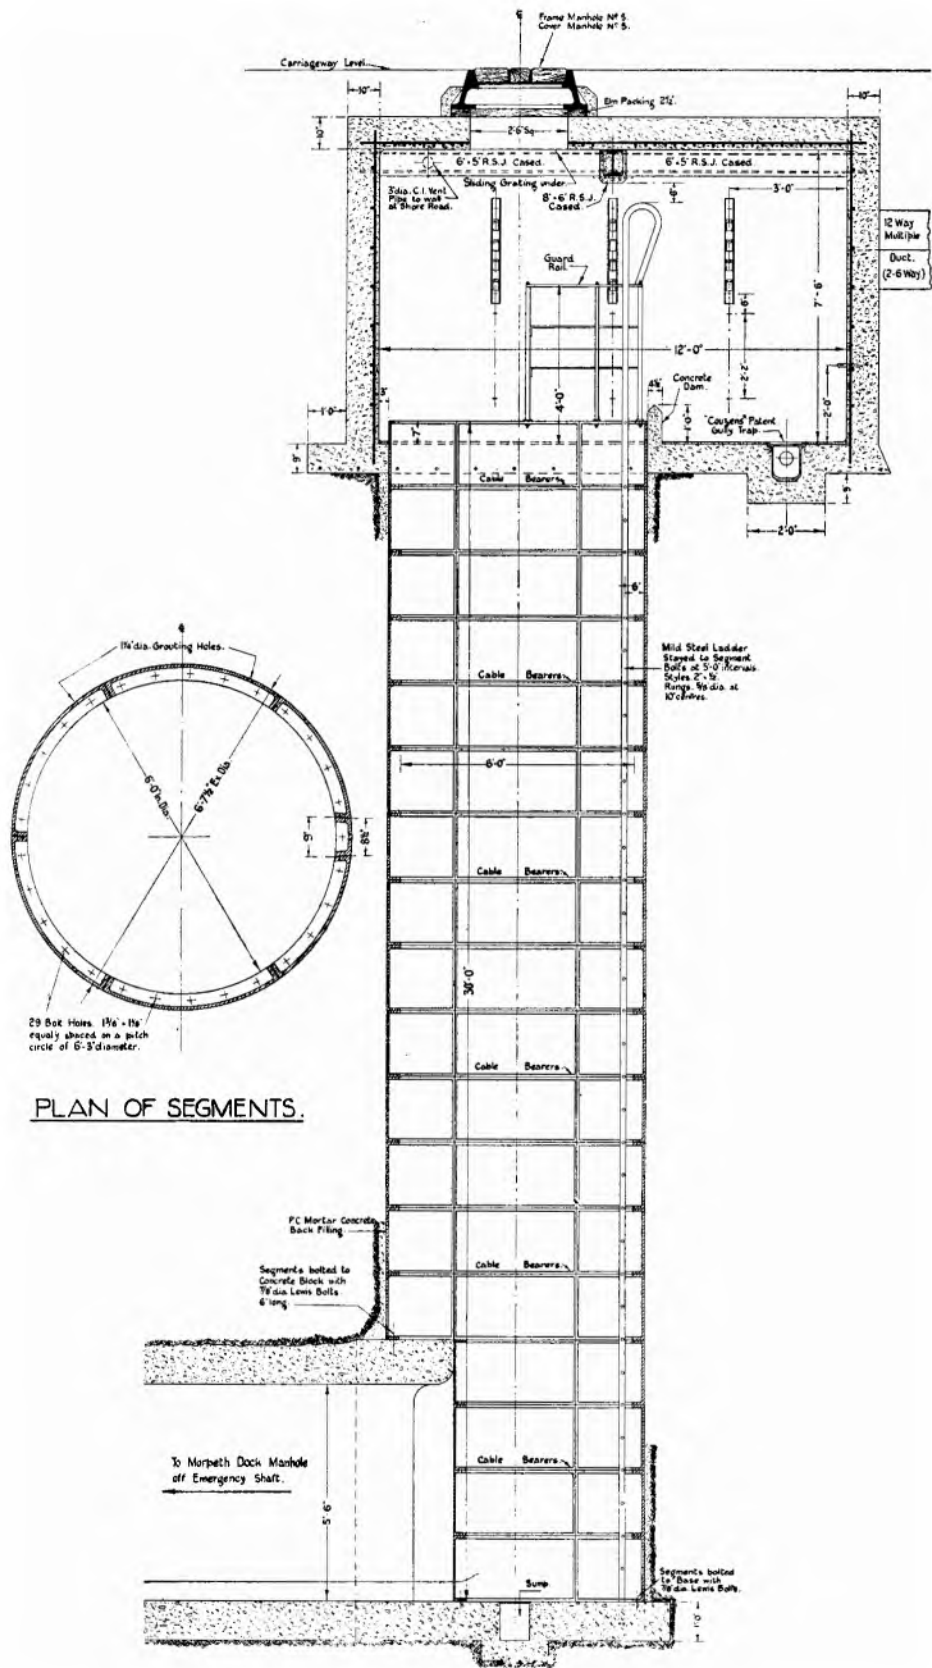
SECTION OF MANHOLE, POINT Q.
